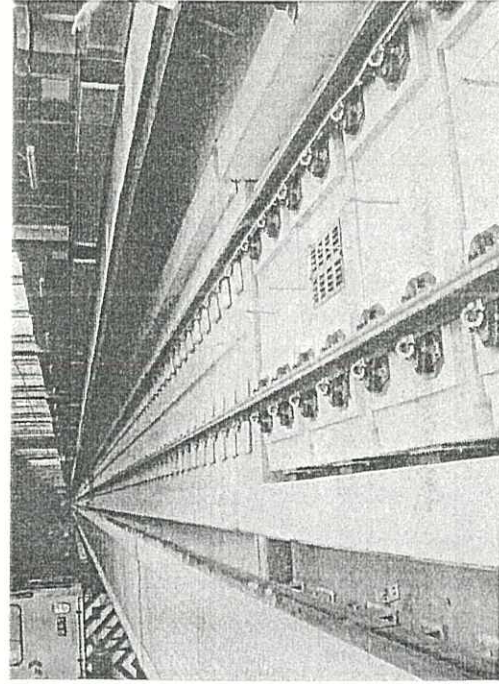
Baseplate of Floating Slab between at Tuen Mun at Grade and Viaduct Section
